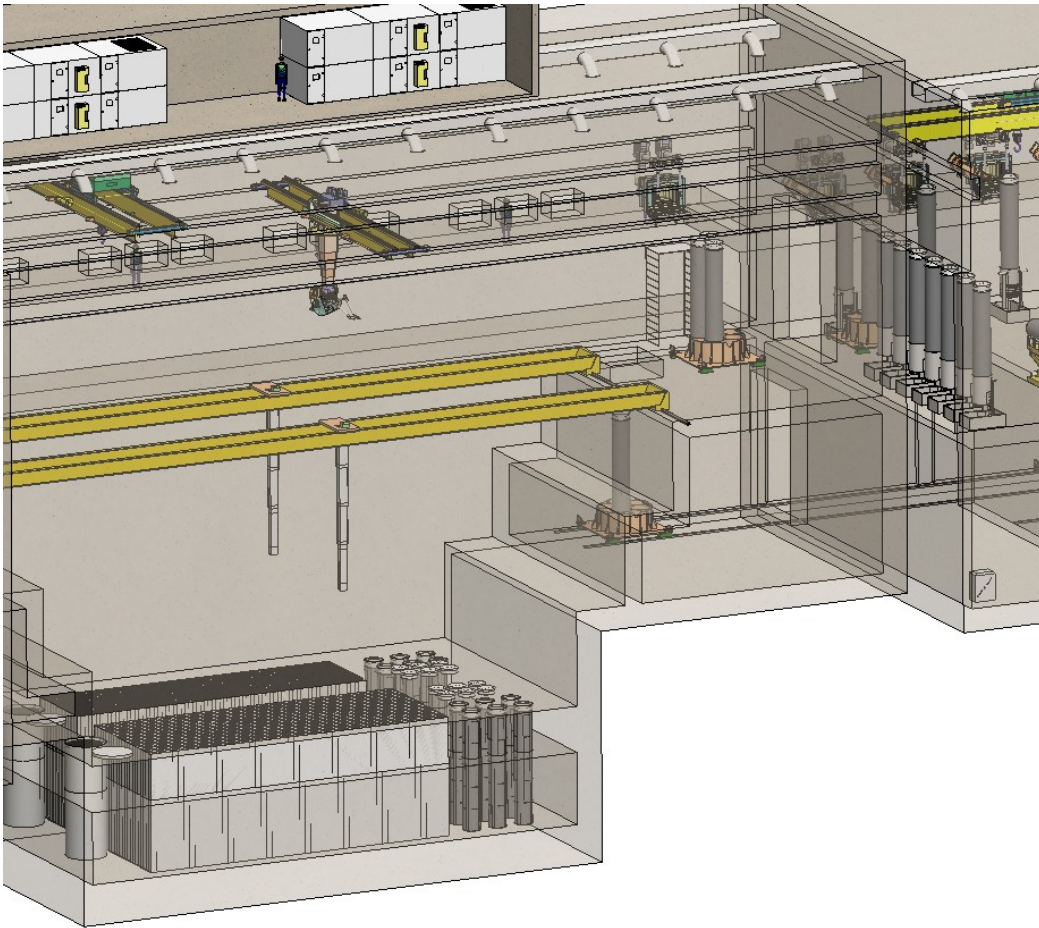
Detail View of the Disposal Canister Side of the Packaging Pool
